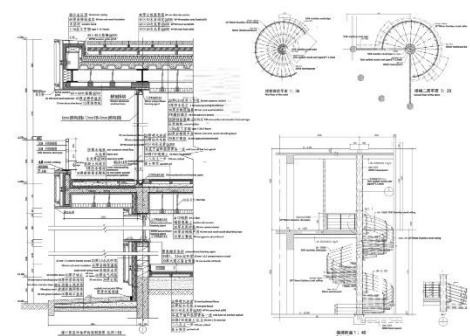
An example of detail construction design course (project: dormitory, source: author)
